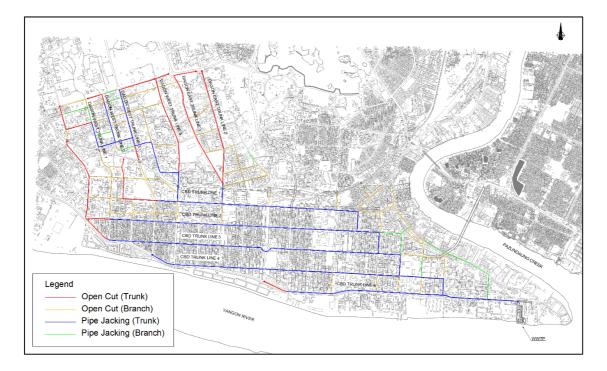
shows the sewer alignment section where the open-cut or trenchless method is proposed to be applied.
